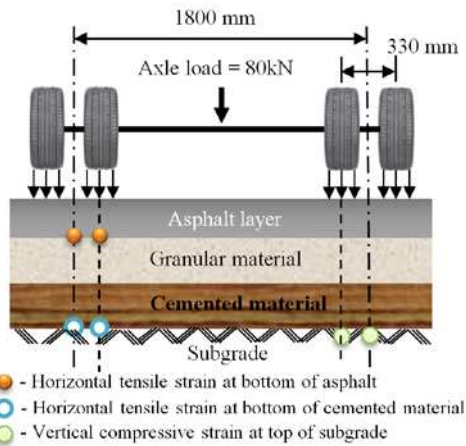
Critical locations of the stains in a pavement structure under standard axle loading (SADT)
